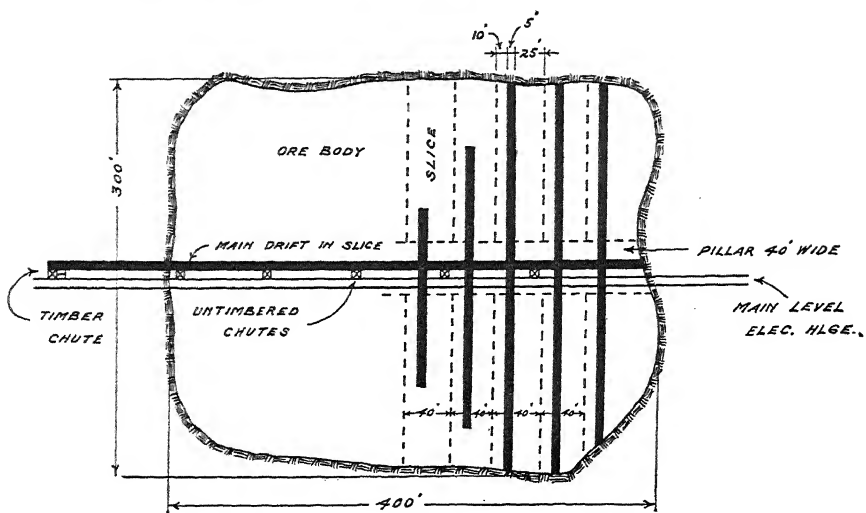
PANEL SLICING. PLAN OF PREPARATORY WORK.
